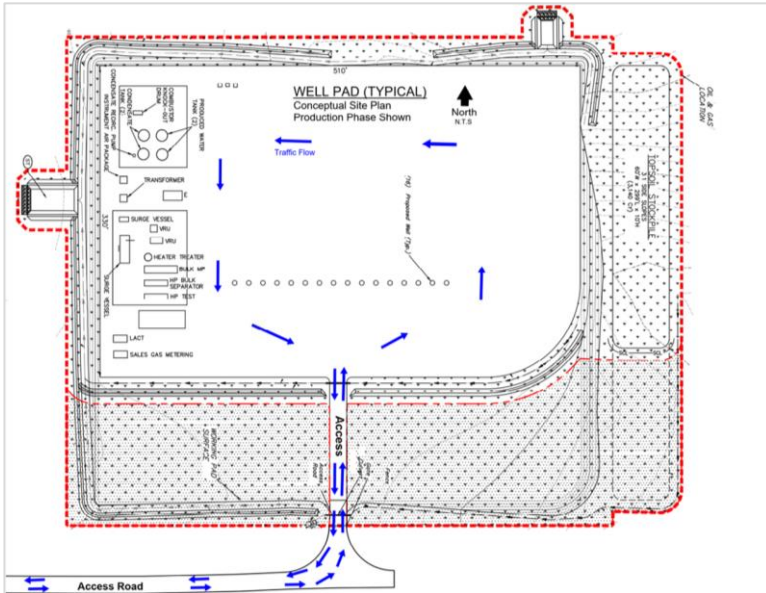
Conceptual Site Plan. (After Uintah, 2022). The access road is to extend from the pad west to Gun Club Road. Arrows shown indicate traffic flow and on-site circulation. Vehicles will exit and turn right onto the access road.
